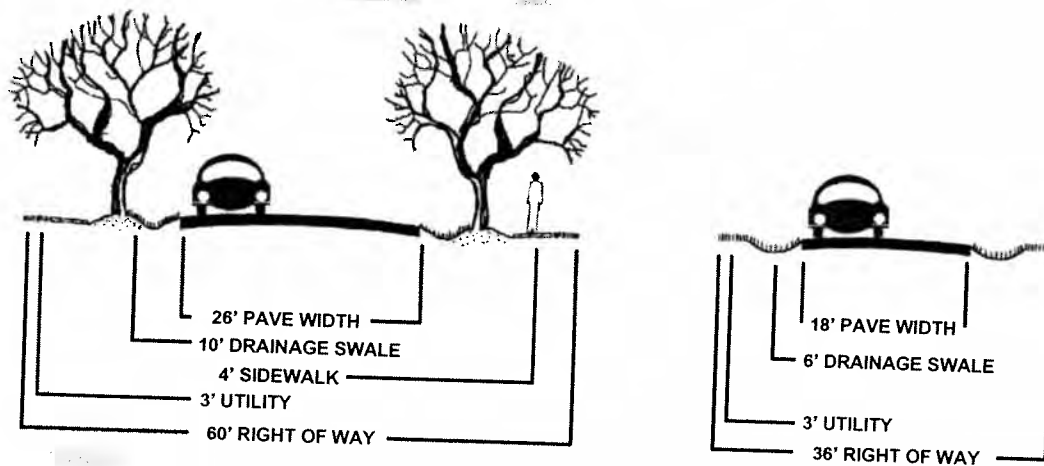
Potential Design Options for Narrower Roadway Widths
